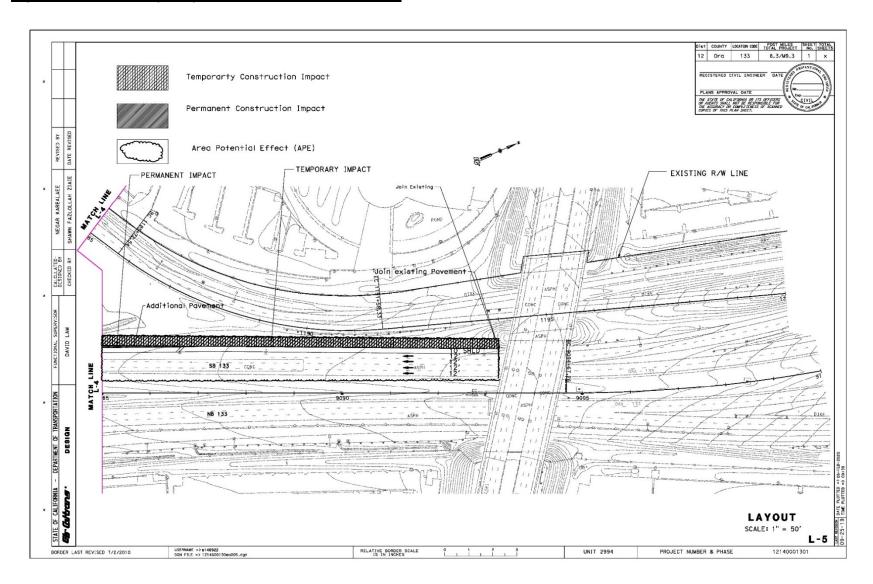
Preliminary Project Plan Sheets (Sheet 5 of 5)
